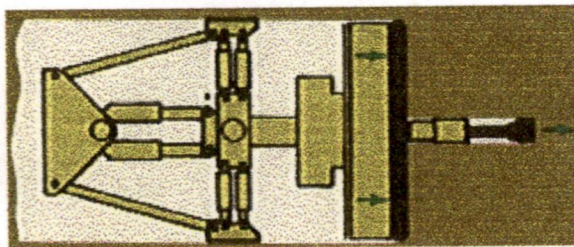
de* elevation of typical three-section Ingersoll-Rand tunneler (12)
